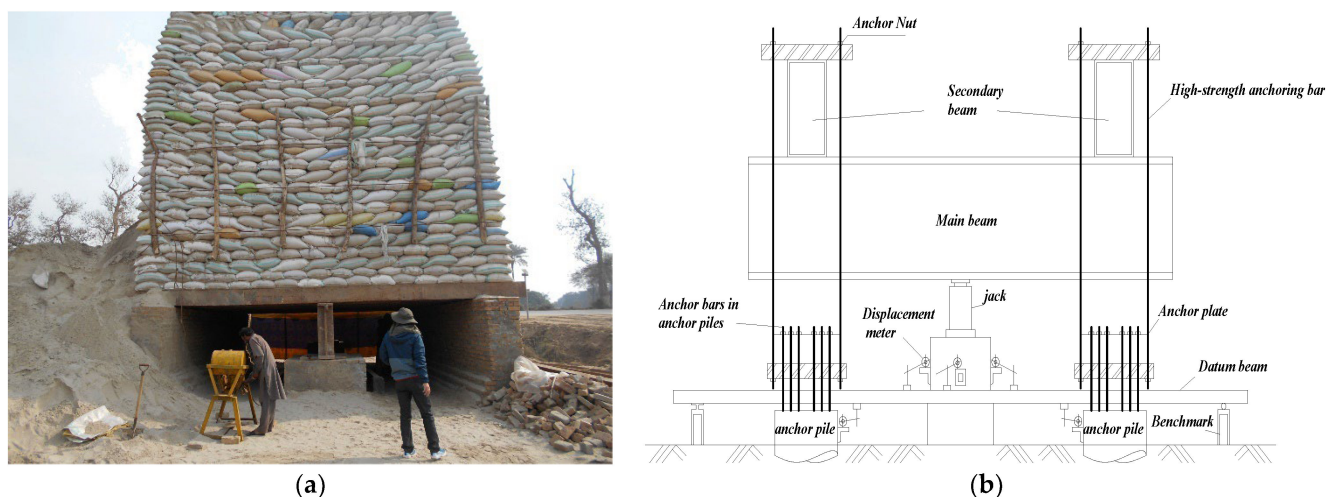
(a) Site views for in situ loading test; (b) Schematic diagram of loading conditions in test pile.
